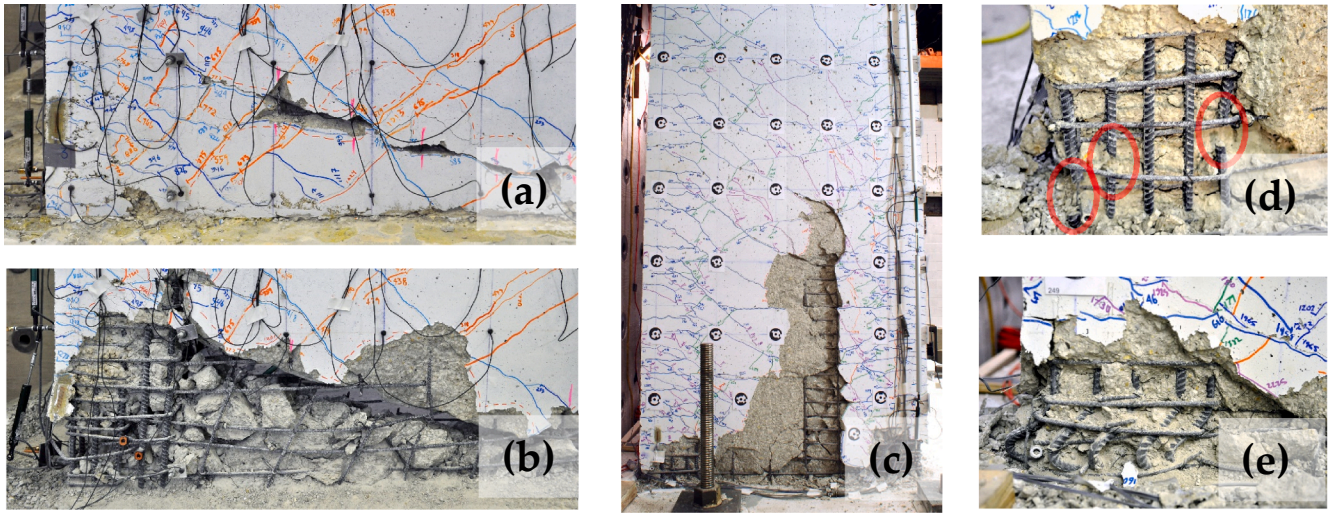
Damage observed in C-shaped specimens: (a) Sliding along cracked interface and web-foundation interface, (b) dowel action in boundary elements, (c) damage to flanges, (d) Boundary element damage in web (fractured bars are circled), (e) Failure of confining reinforcement resulting from buckling of vertical longitudinal bars.
